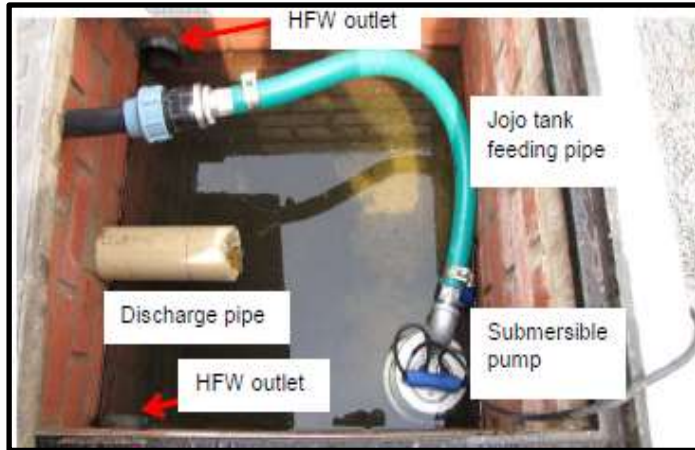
Submersible pump inside HFCW outlet chamber (Photo courtesy of BORDA engineers)
